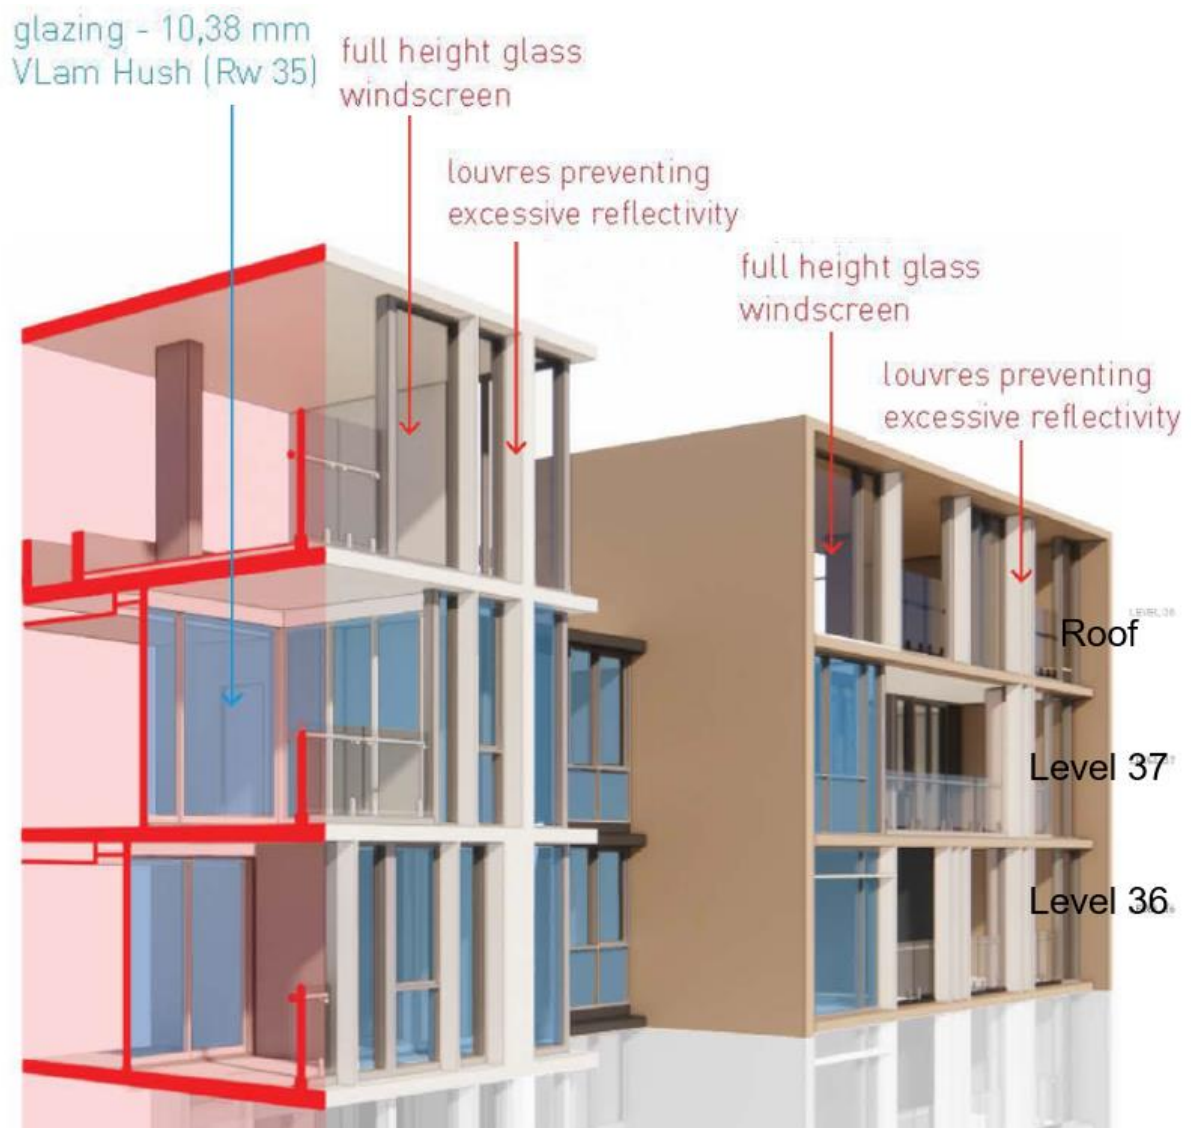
Section Plan and Perspective Plan of the façade of Building A which is orientated towards the M2 Motorway showing the glazing, full height windscreen and louvres.
